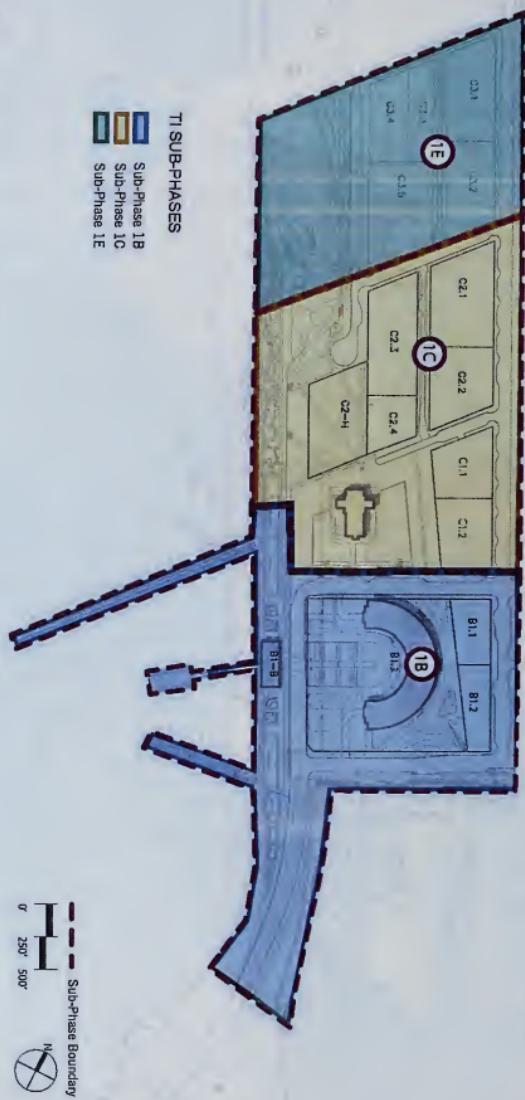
SUB-PHASE APPLICATION 2 SITE PLAN
